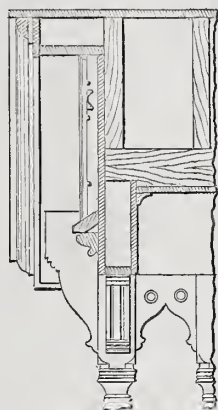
Elevation of Hall Stairs.—Scale, $\frac{3}{8}$ Inch to the Foot.
